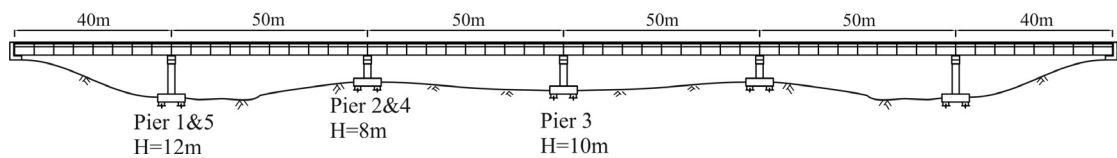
Longitudinal elevation of the irregular prototype bridge –symmetric about pier 3.
